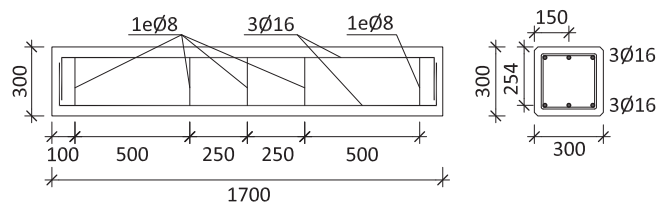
Geometry and steel reinforcement of the tested beams (all dimensions in mm).
